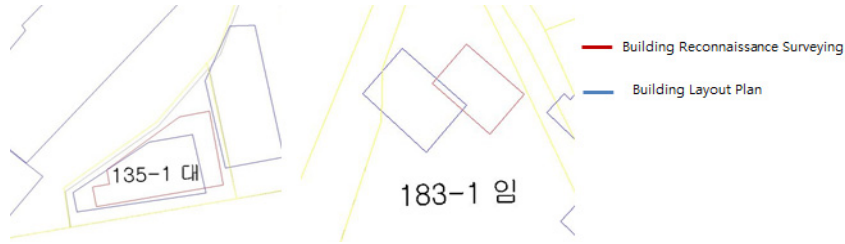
Comparison of Building Locations in Building Reconnaissance Surveying and Building Layout Plans
